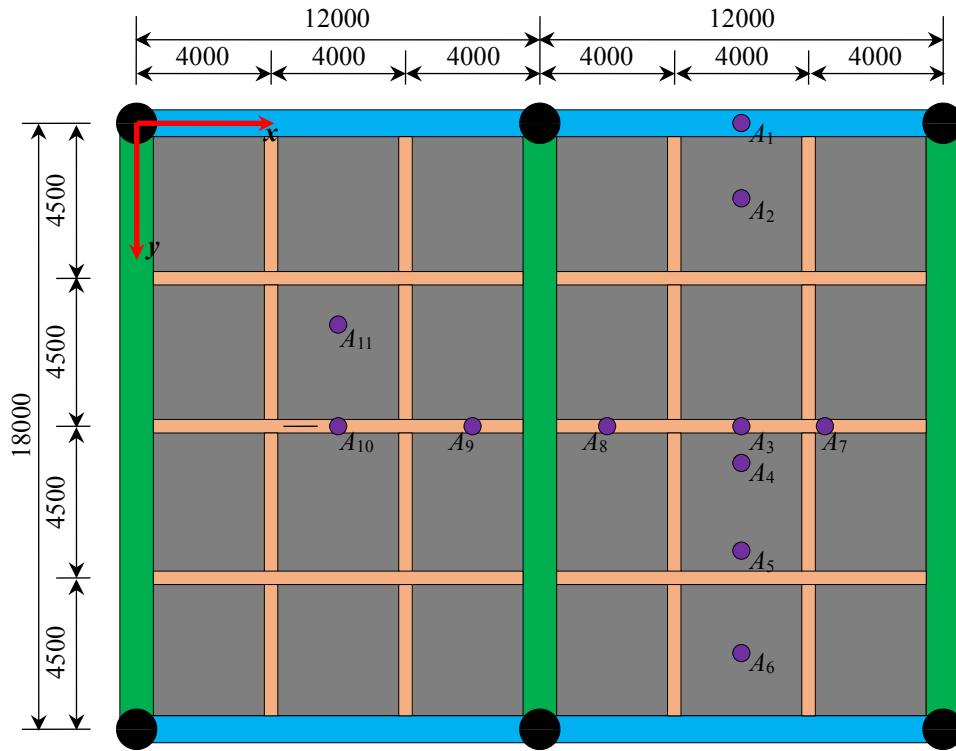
Outline of prestressed concrete floor #3 (all dimensions in mm)
